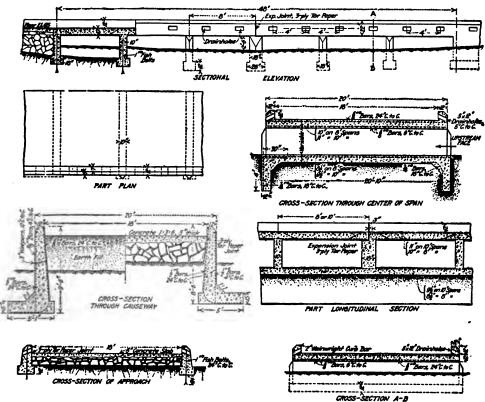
CONCRETE OVERFLOW BRIDGE, BEXAR COUNTY, TEXAS.
